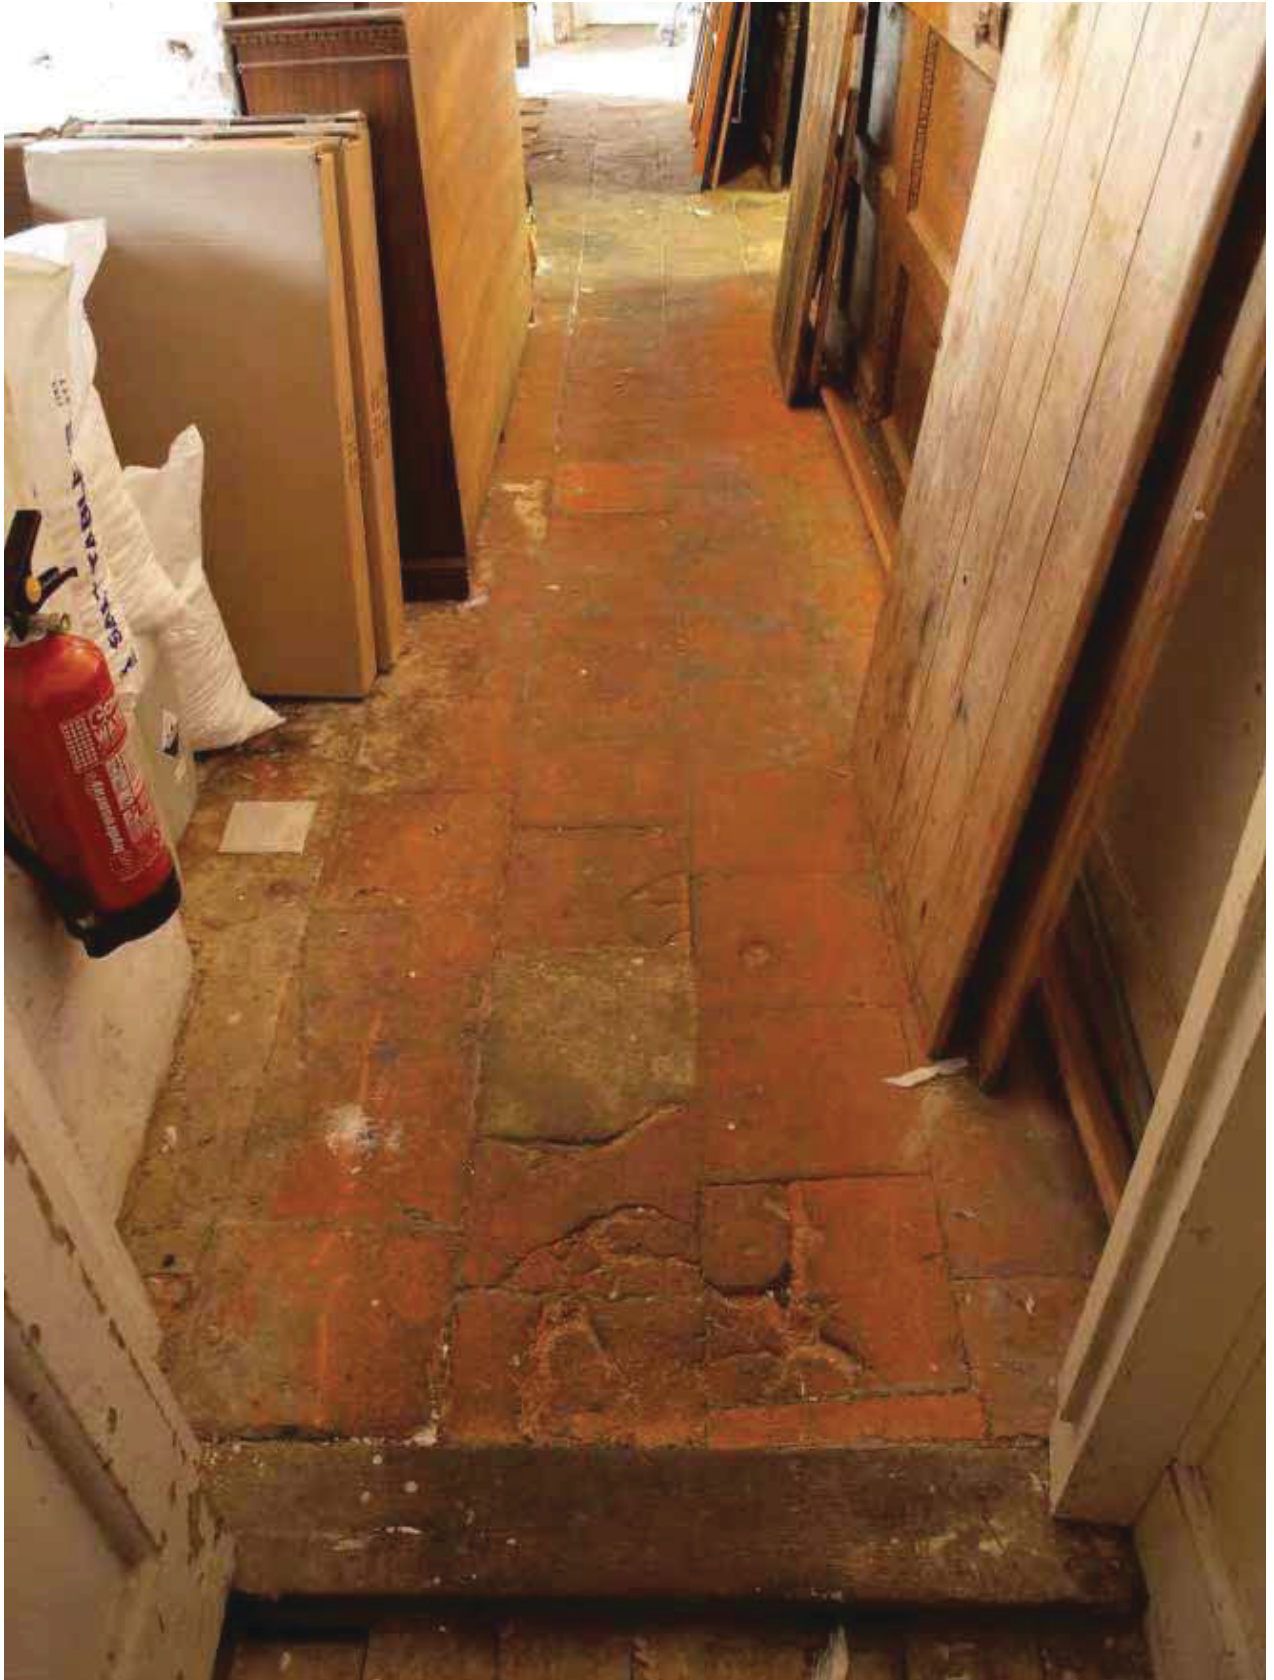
Clay tiles at east end of Corridor 4 to be repaired
